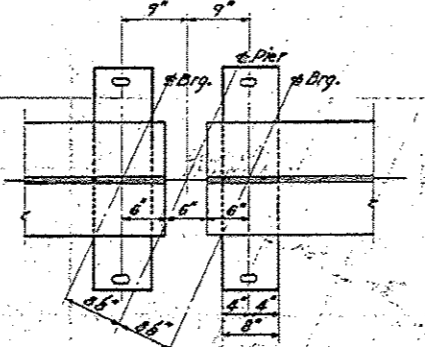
DETAIL OF EXPANSION BEARING AT PIERS 2, 5, 6, 7
